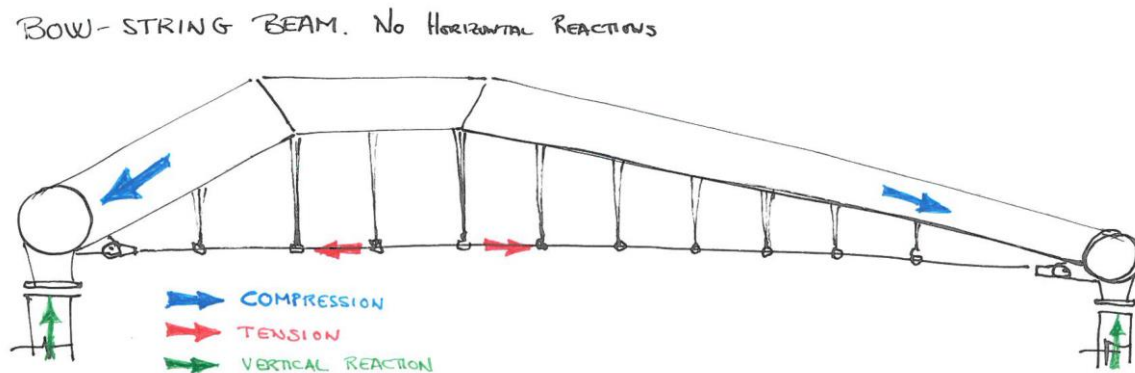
Longitudinal beam structural concept [Sketch by Arenas&Asociados]
